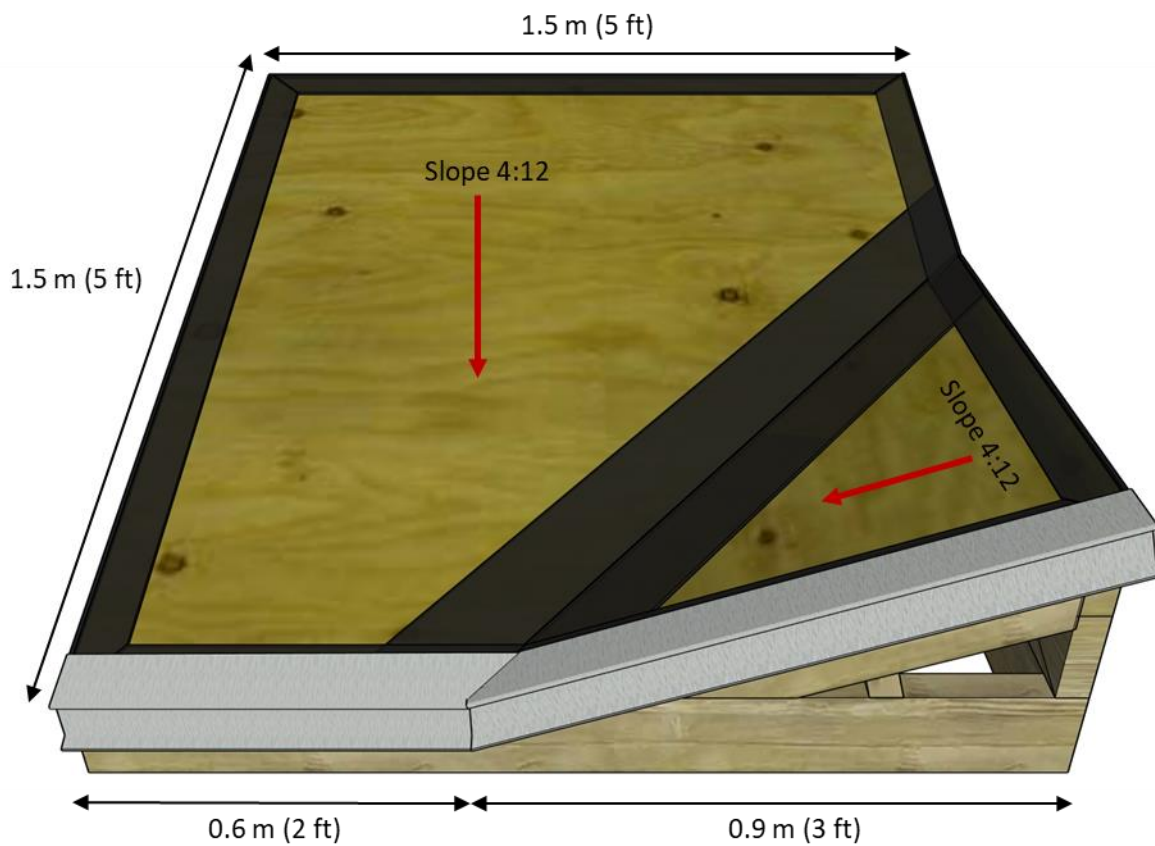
Test specimen deck constructed from wood framing and plywood sheathing
